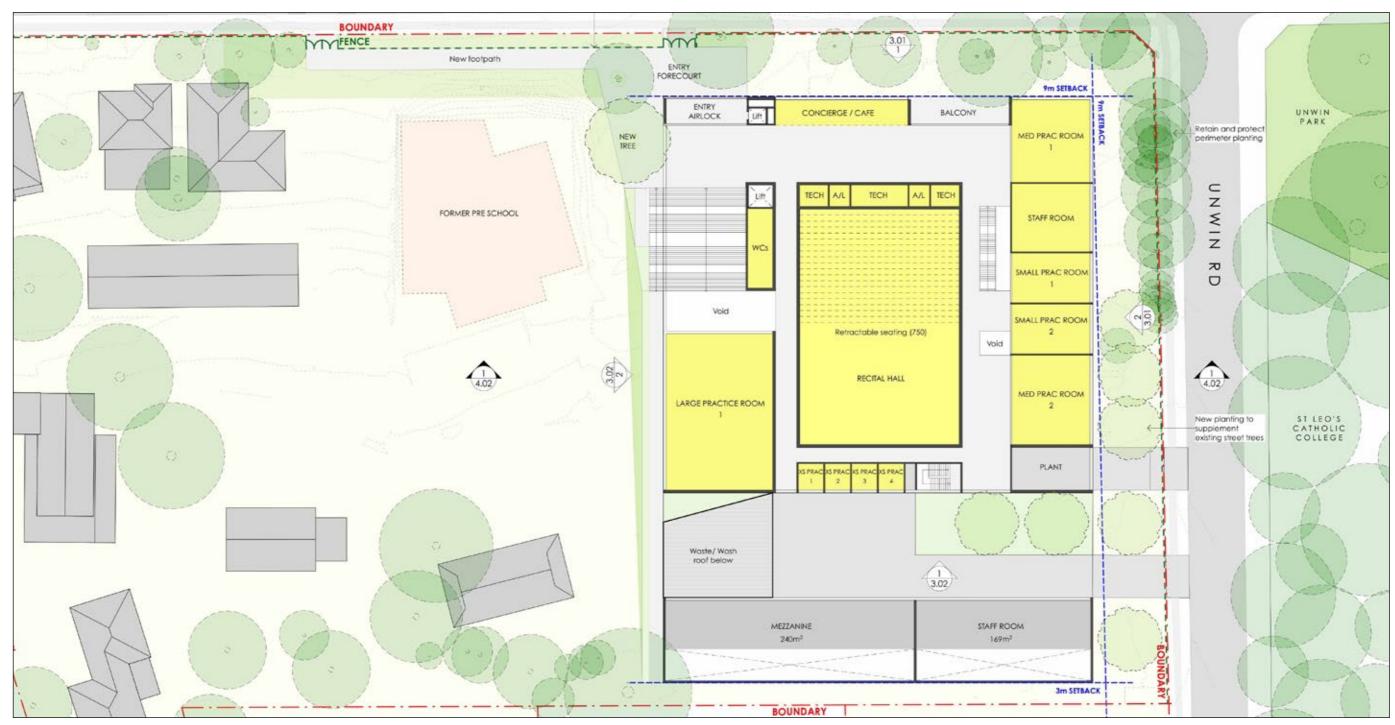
CO-CURRICULAR PERFORMING ARTS AND EXAM CENTRE GROUND FLOOR PLAN (NEESON MURCUTT + NEILLE ARCHITECTS MAY 2022)
